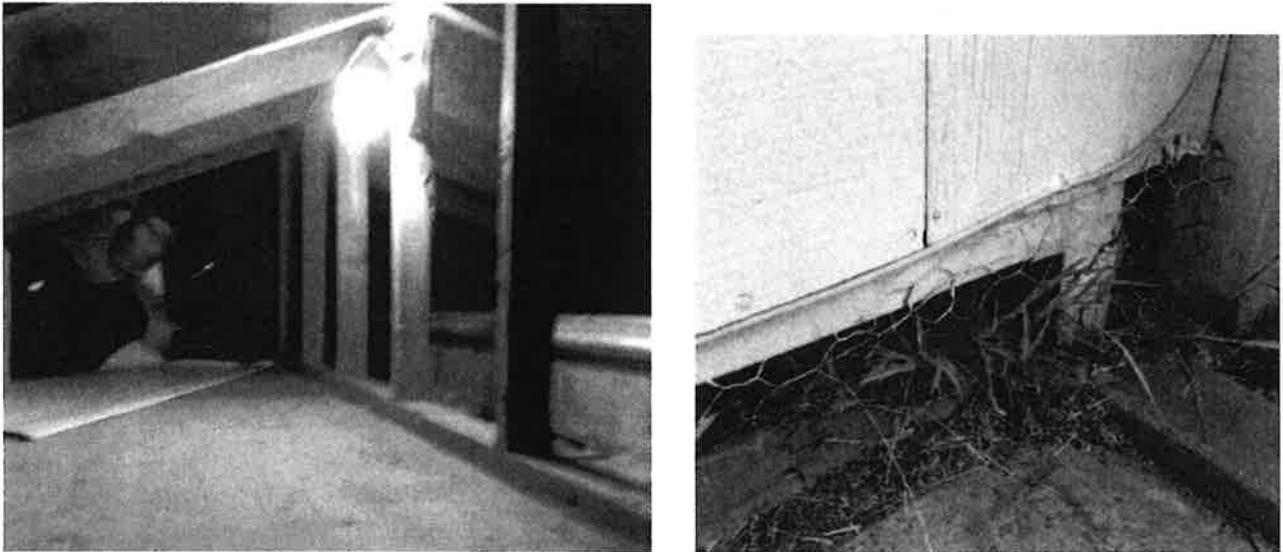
and 16: Expansion and Infill – Roof framing and infill construction
